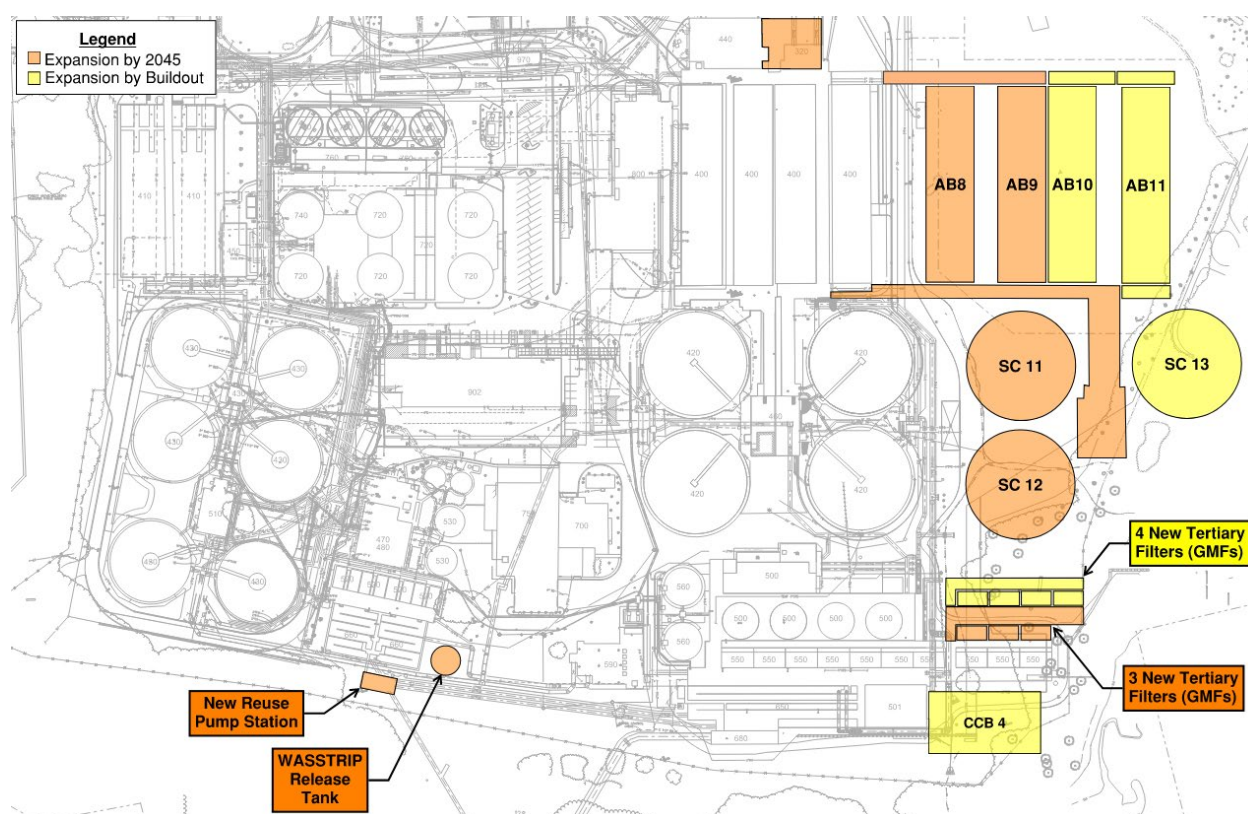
Site Plan for GMF Expansion for Scenario A
